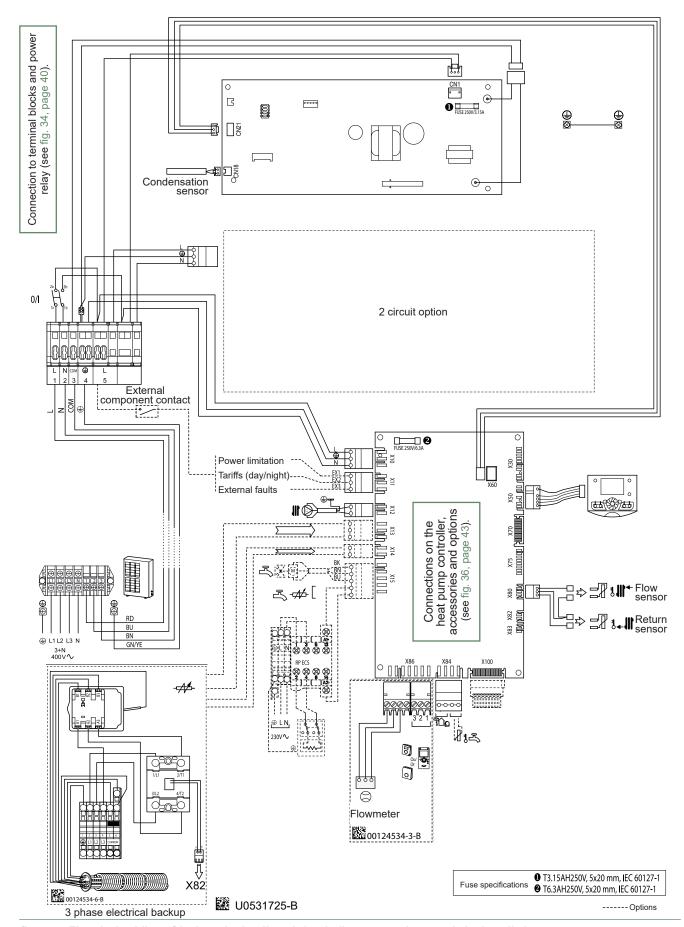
Electrical cabling of 3-phase hydraulic unit (excluding connections made by installer)
